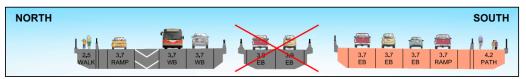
Deerfoot Trail Proposed Stage 1 Bridge Cross Section
